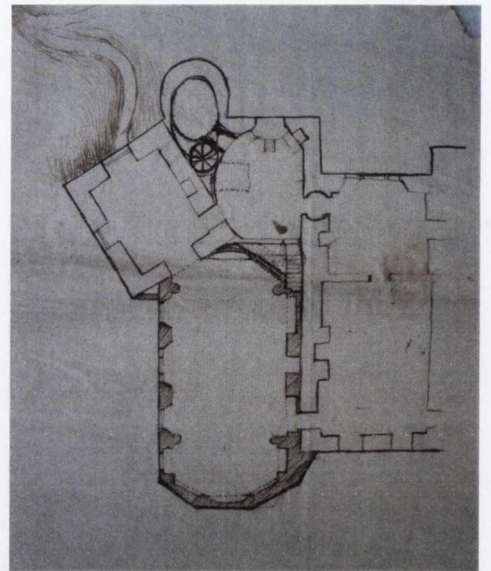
Birr Castle, proposed plan of new drawing room, attrib. to Laurence Parsons, [1802–1804], Rosse papers, O/17/21.
